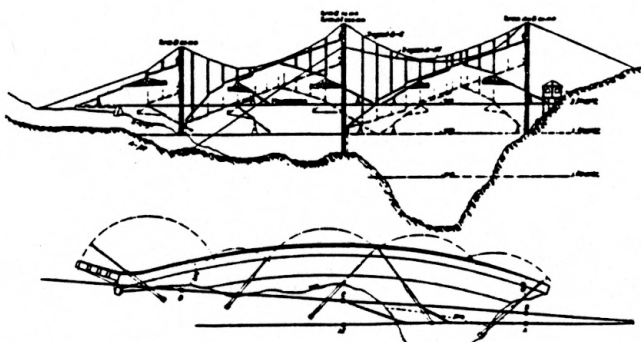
Structural drawing of the barrage used at the onset of the chapter "Our Technical Equipment". (From COT, p.139)
